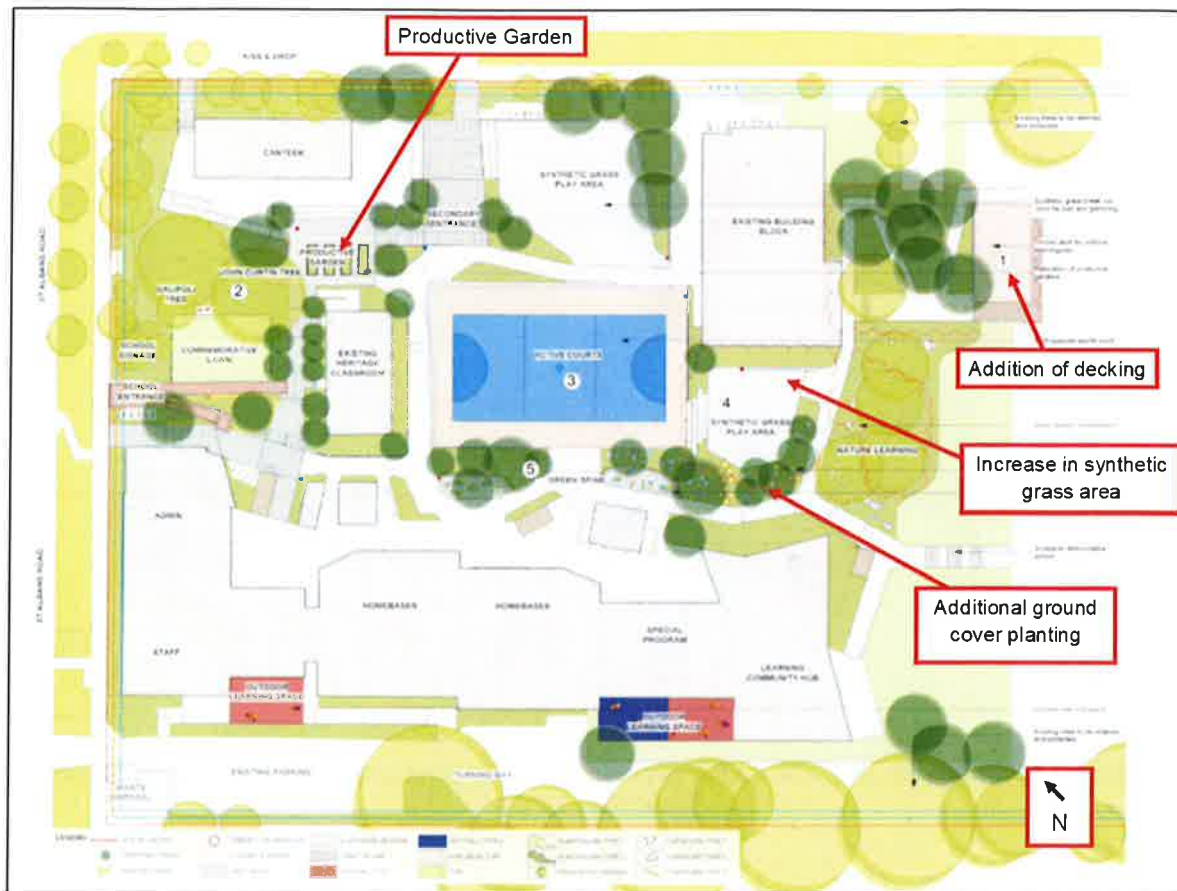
| Proposed Landscape Plan (Base source: Applicant's Modification Application 2019)
